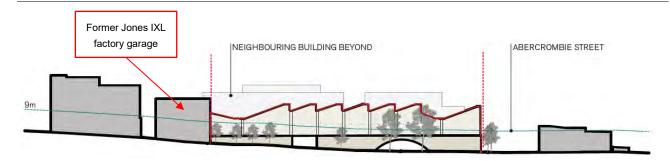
Streetscape Elevation – Eastern Side of Golden Grove Street
